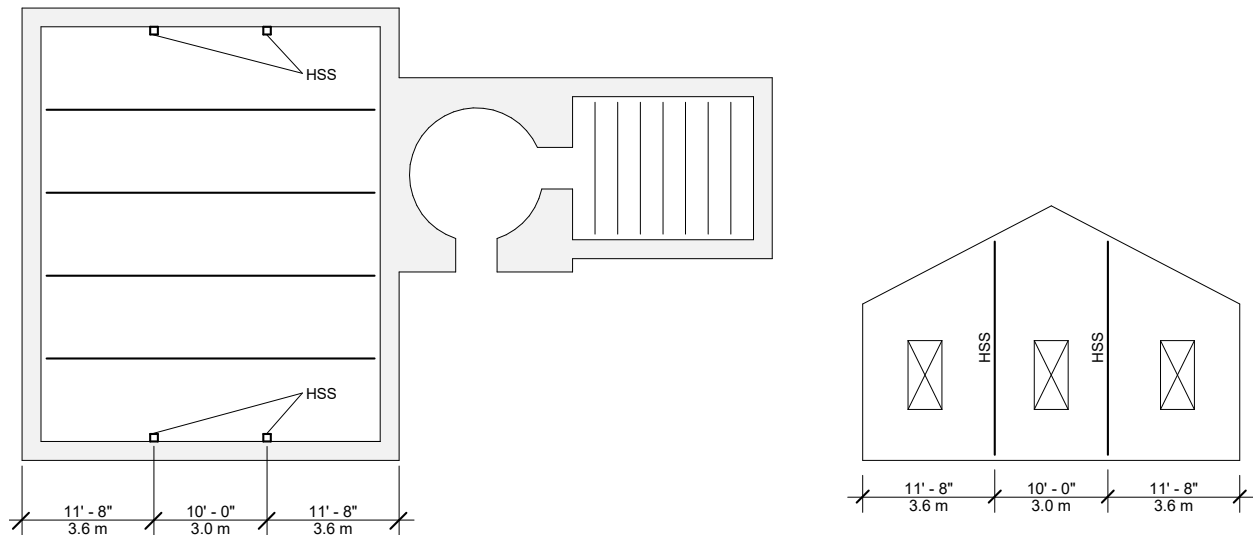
Strong-Backs Retrofit Scheme Plan and Elevation
